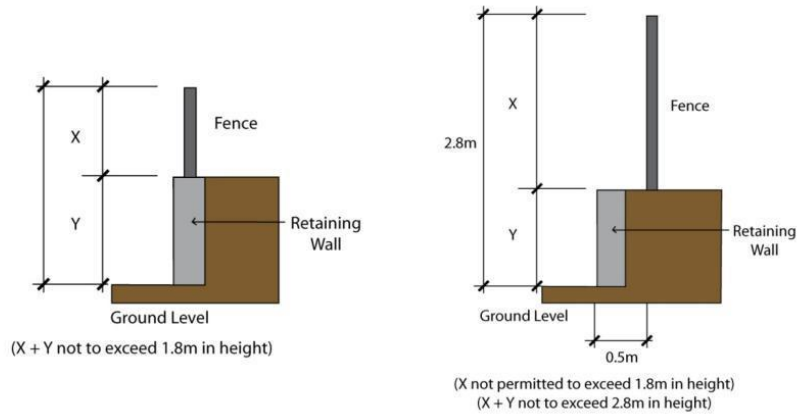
Lot Fencing Abutting a Road Reserve on a Retaining Wall
